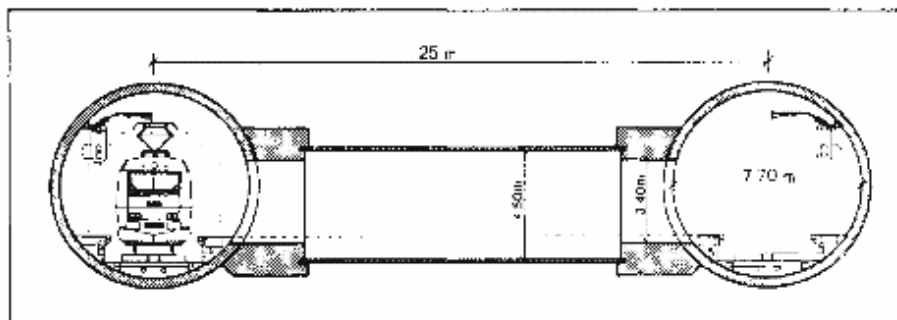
Eastern Railway Tunnel: cross section in bored tunnel.
